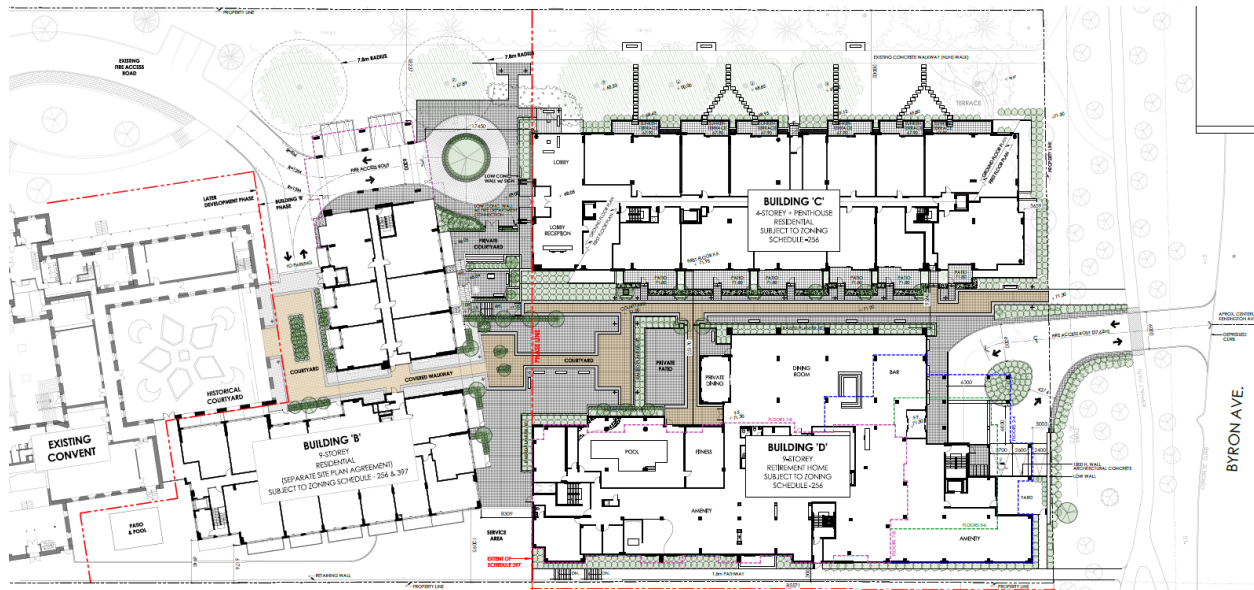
Site plan of development. Image credit: M. David Blakely Architect Inc.
